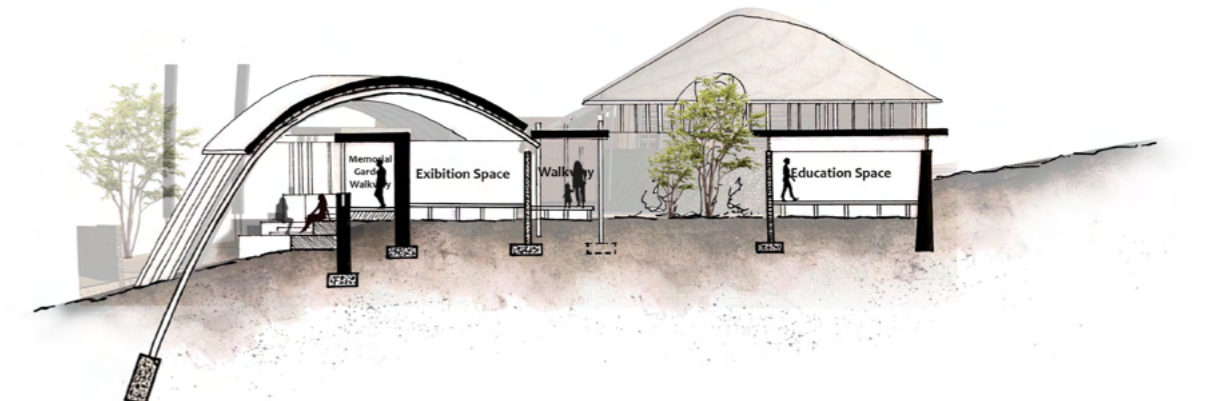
Design proposal 3 Ritual Pavilion cross-section (Author, 2021)
